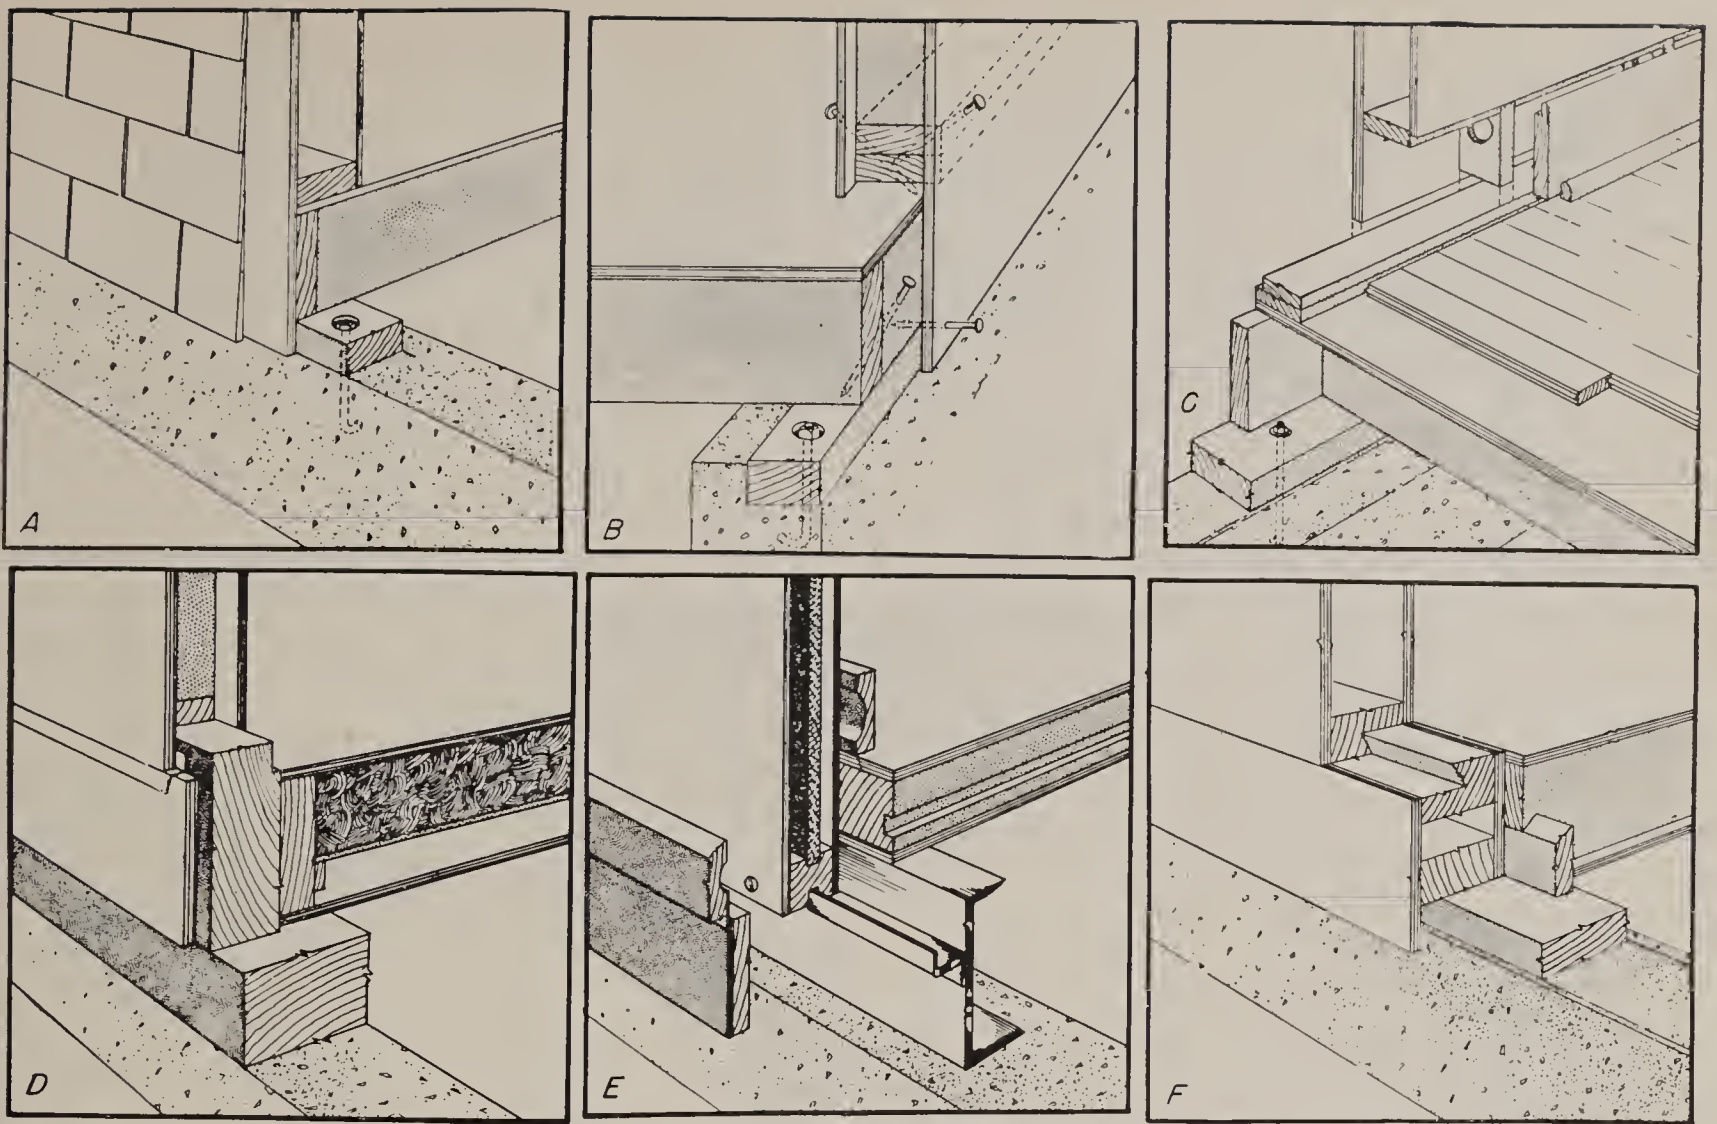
Various methods of joining superstructure to foundation. *A*, desirable method of connecting nailed wall panels to floor and foundation; *B*, recessed foundation sill with wall panel overlap; *C*, sill plate bolted to foundation, conventional joist and floor construction, and prefabricated wall panel with base opening for electric wiring; *D*, method of connecting stressed-cover wall and floor panels to foundation by means of vertical sill bearing on sill plate; *E*, floor and wall panels clipped to foundation by means of channel fitted with flange for wall support; *F*, machined hook joint in wood members used to connect floor and wall panels to foundation.
